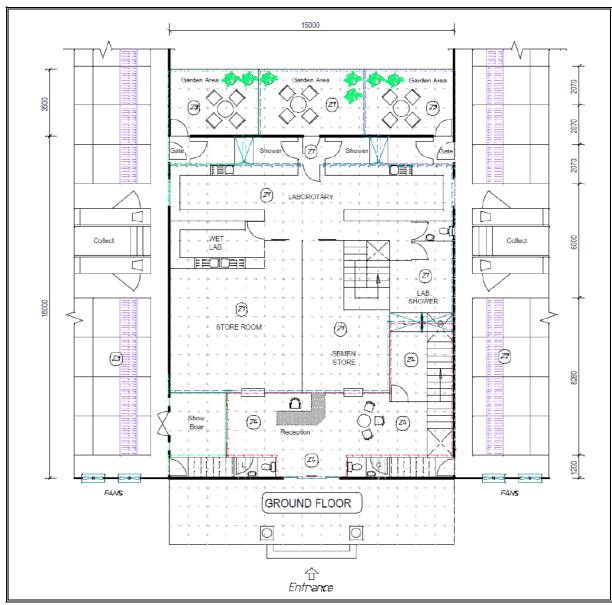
Proposed ground floor layout for the offices and laboratory (designed by Dalein Plaasbou, 2017)
